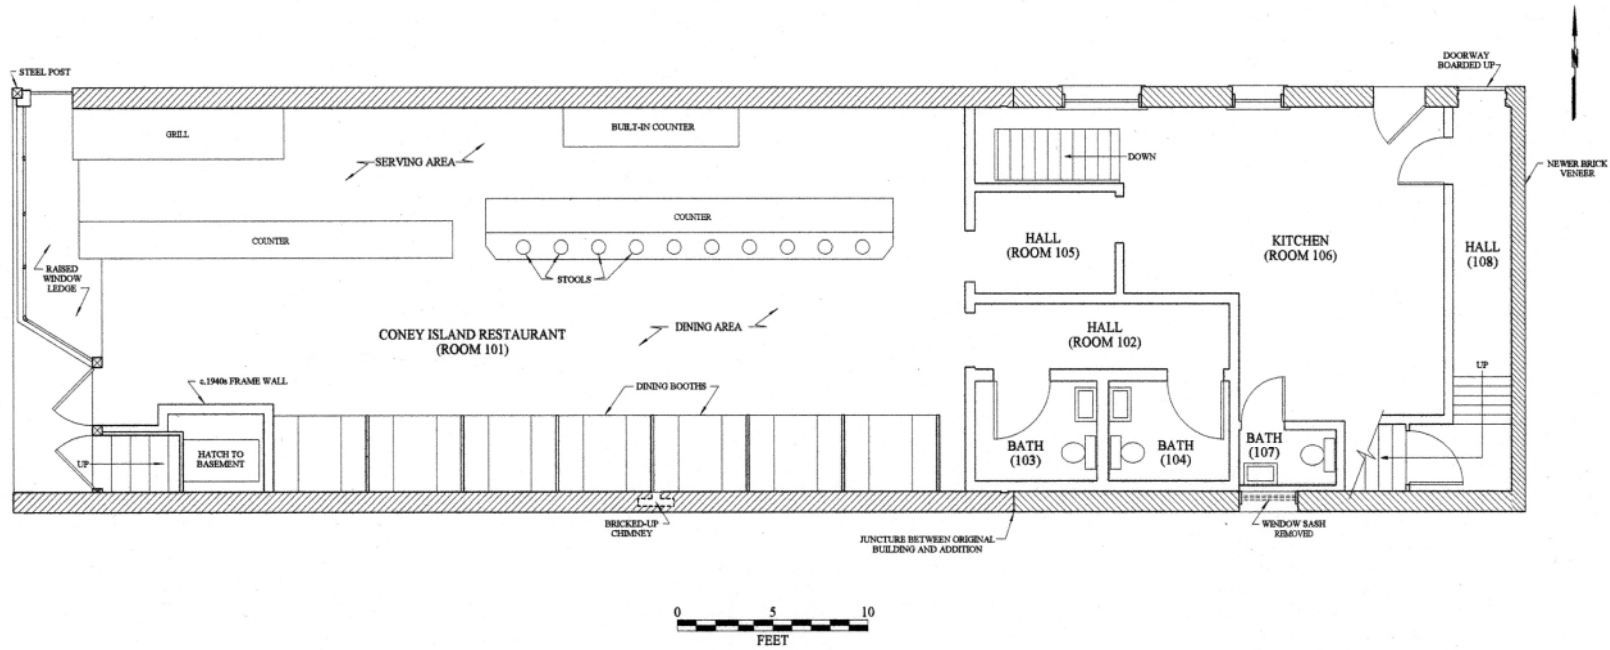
First floor plan of the Coney Island Building, showing conditions in 2000.
